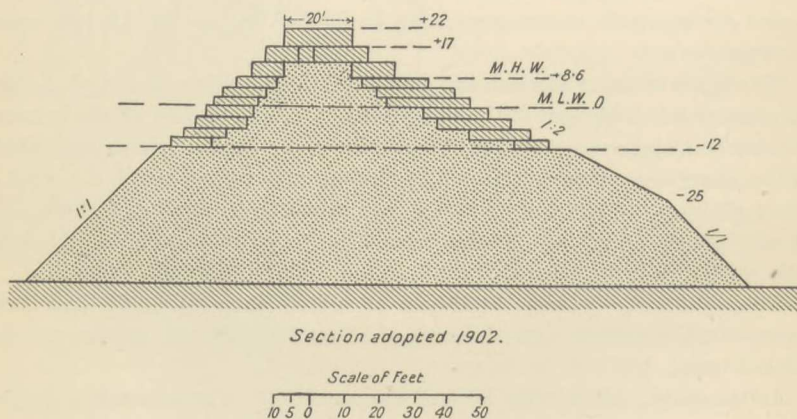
Section of Breakwater, Sandy Bay, U.S.A.
